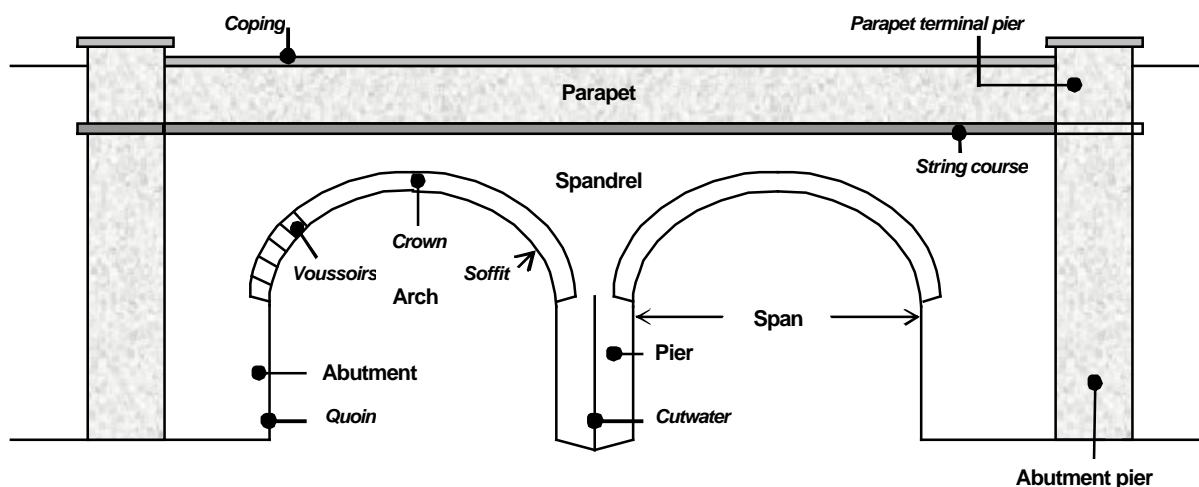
Principal elements of a typical masonry arch bridge carrying a road or railway over a river.
